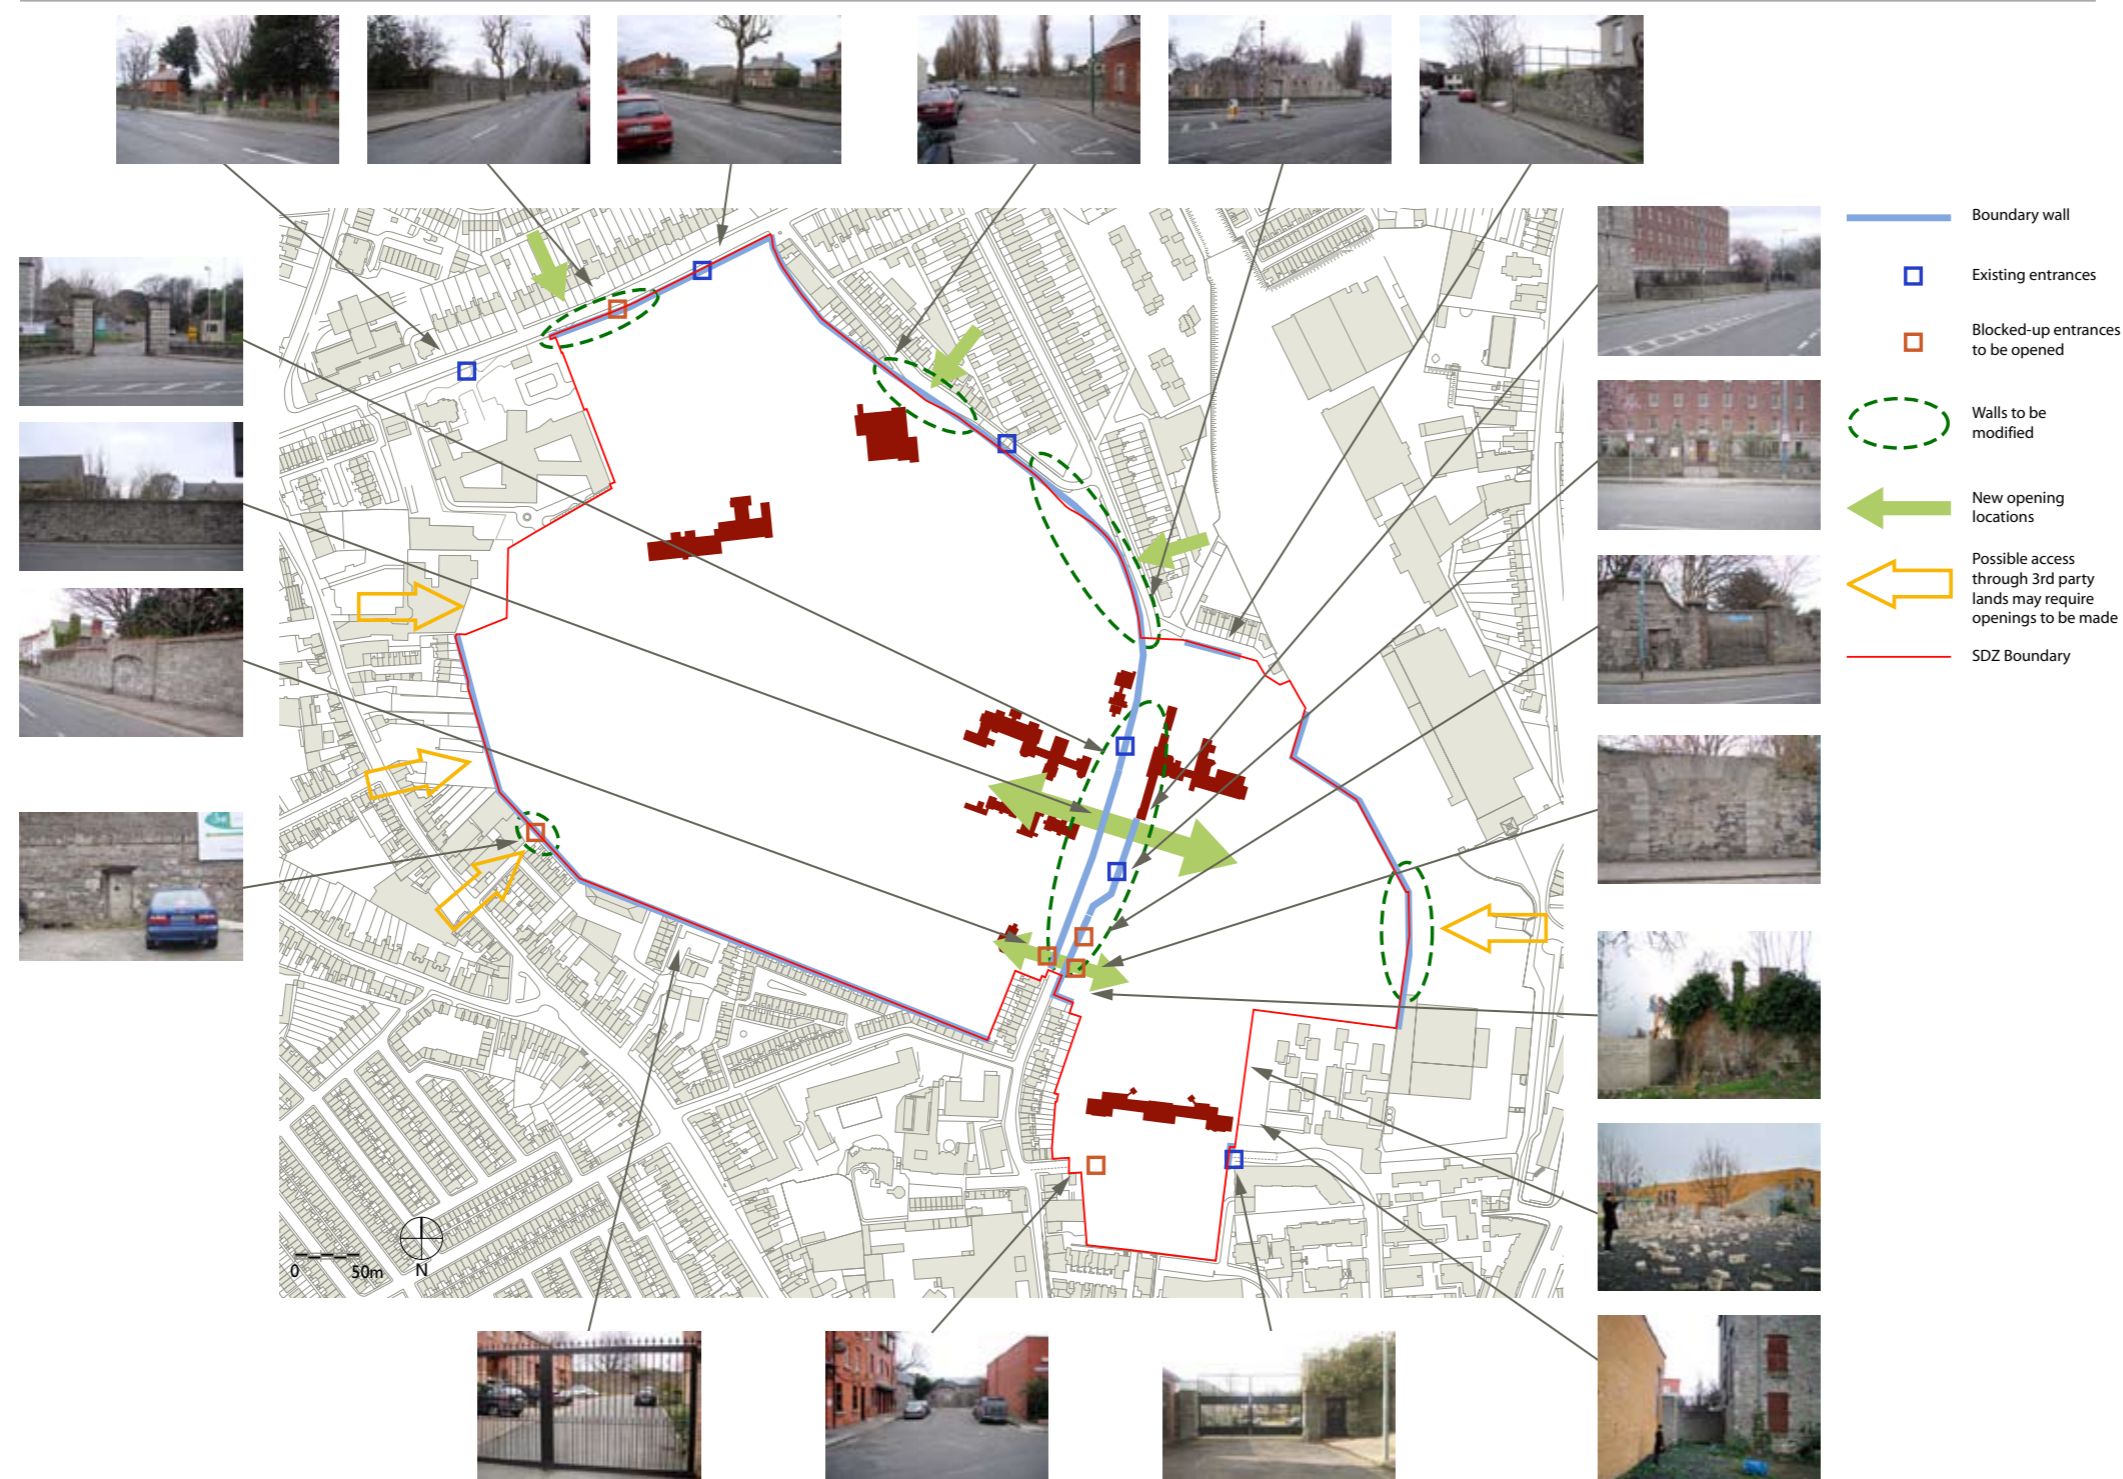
Key plan identifying site boundary wall highlighting section which may be modified.
